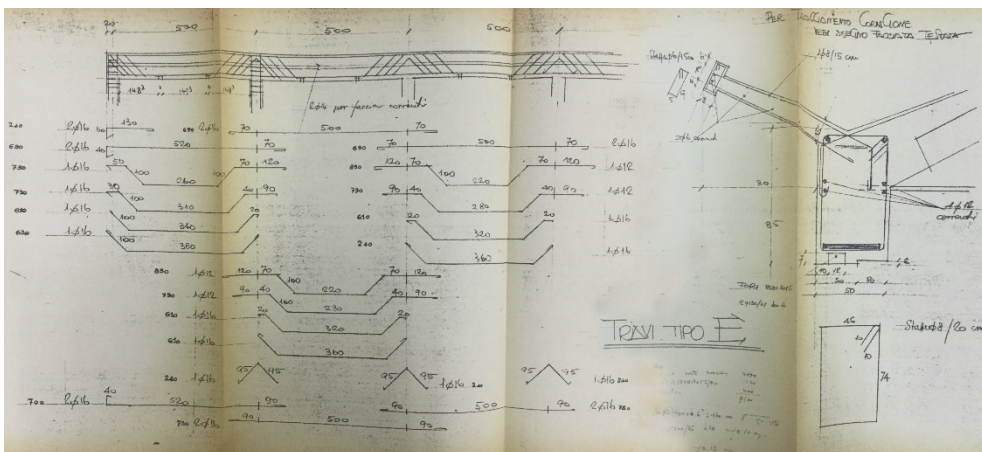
Longitudinal rebars and stirrups of beams of the case study.
